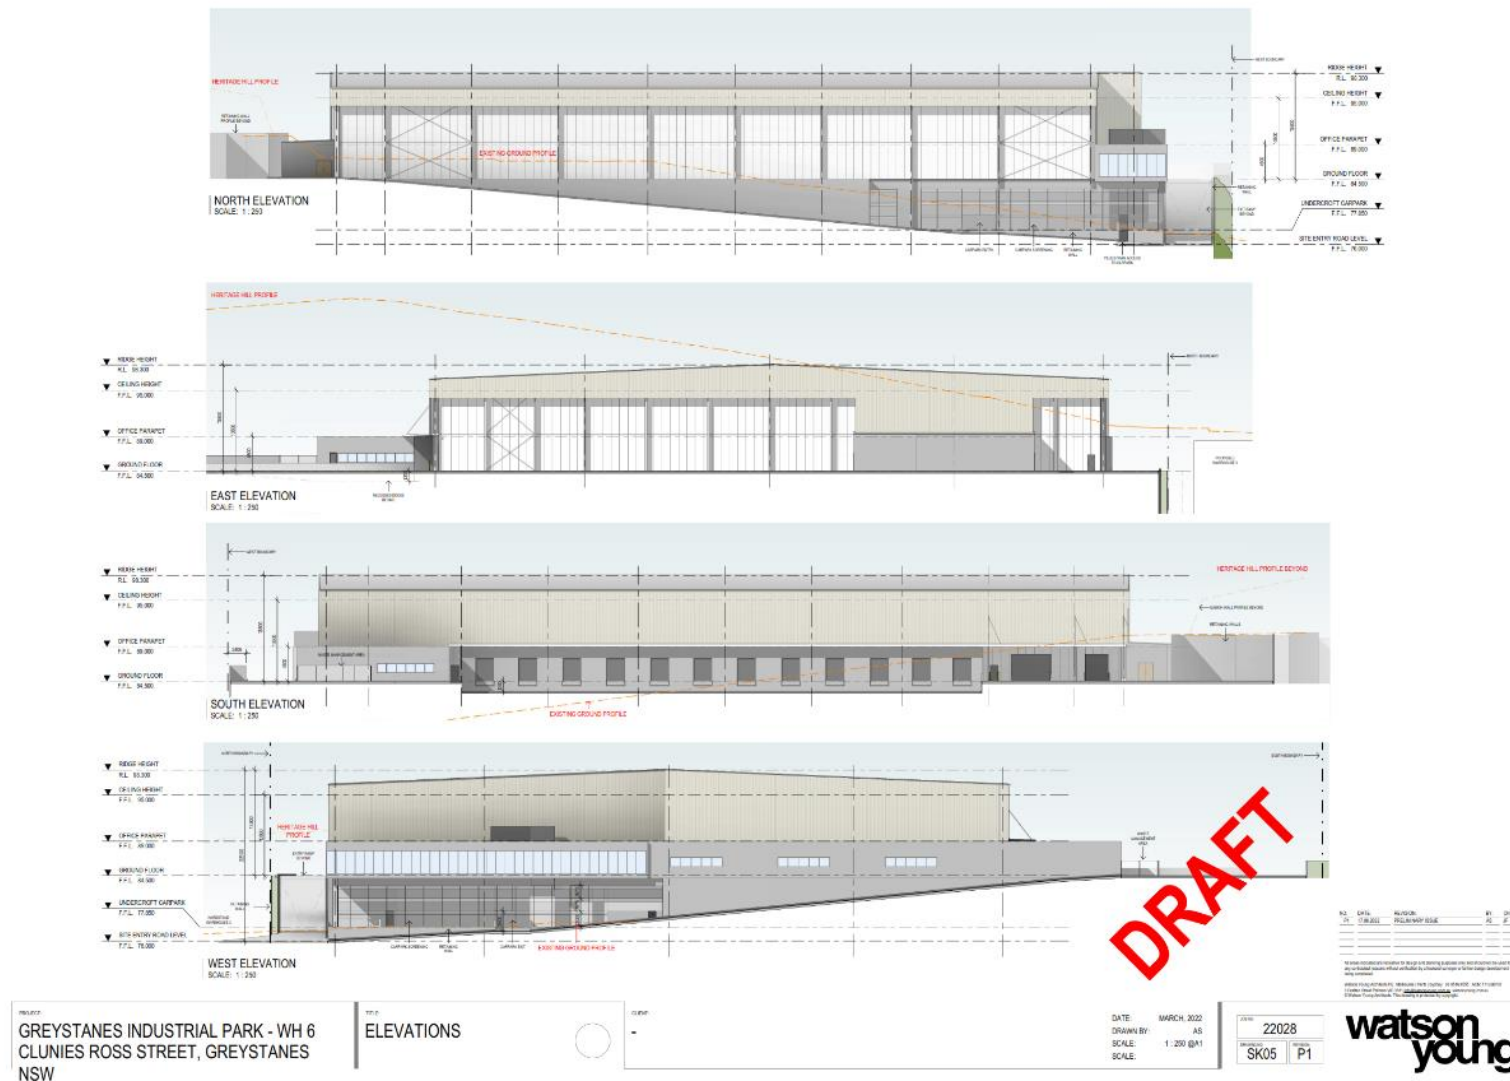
Warehouse 6 Elevations. Source: Watson Young (March 2022)
